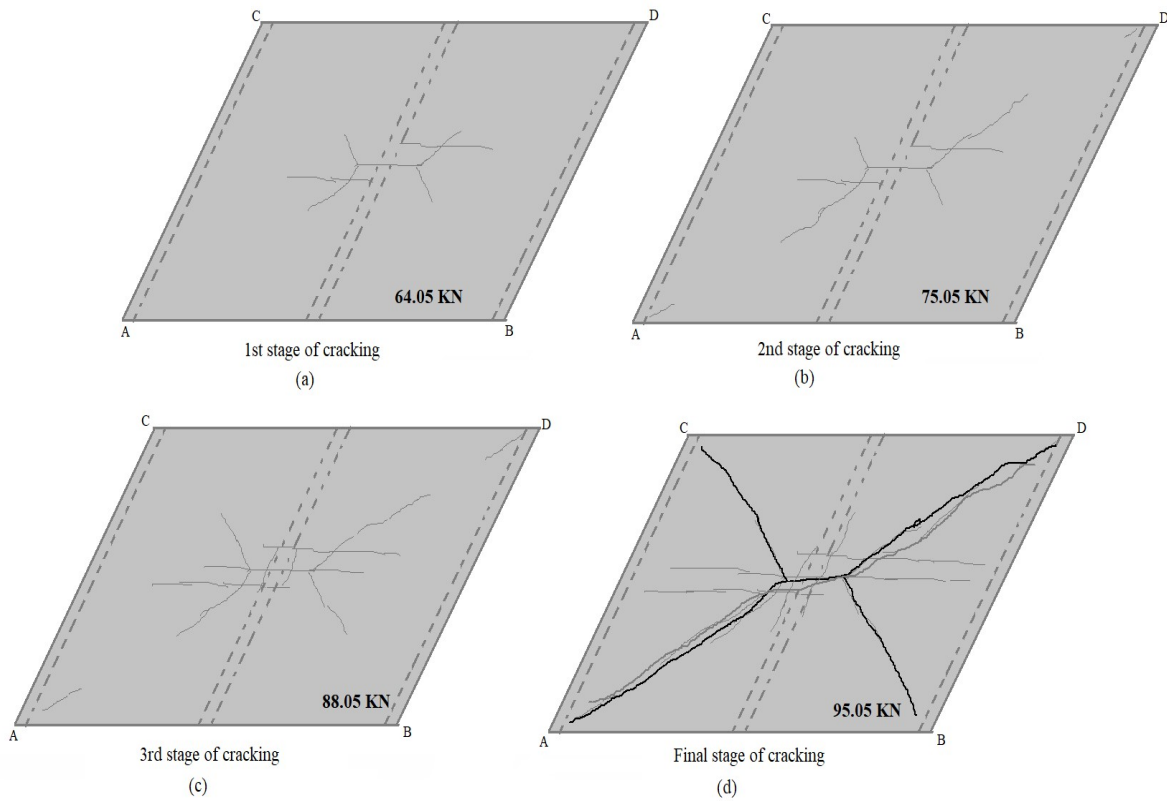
Cracking pattern of RC stiffened skew slab, S60B3 at various stage
